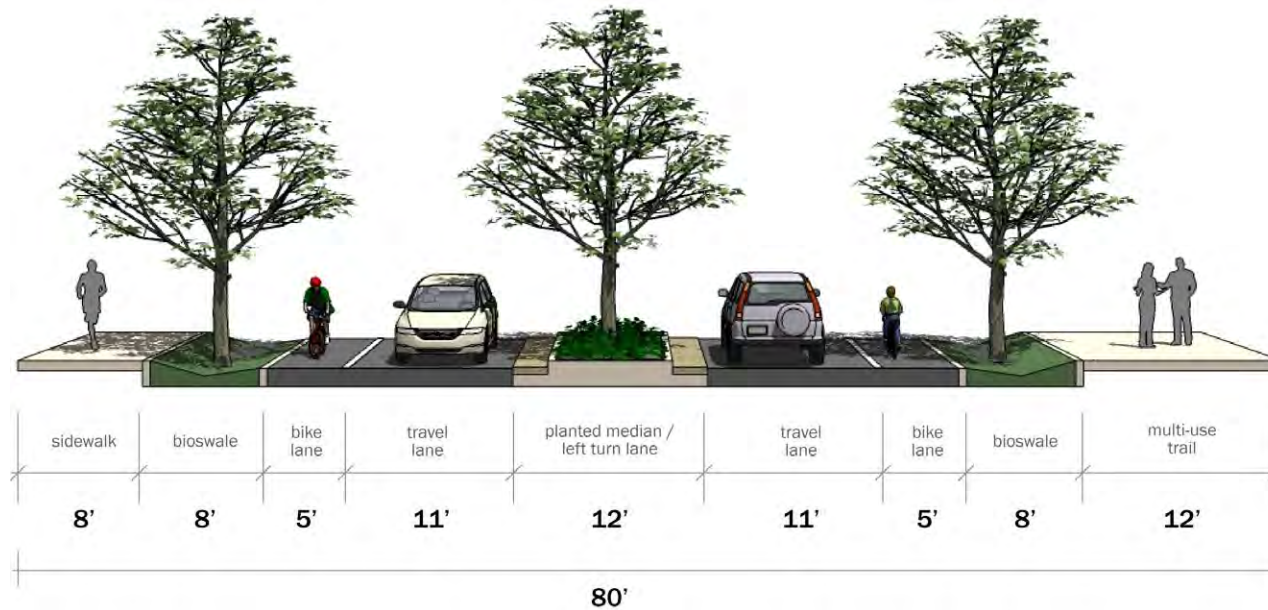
Cross-Section 1: As proposed in the Transportation System Plan
